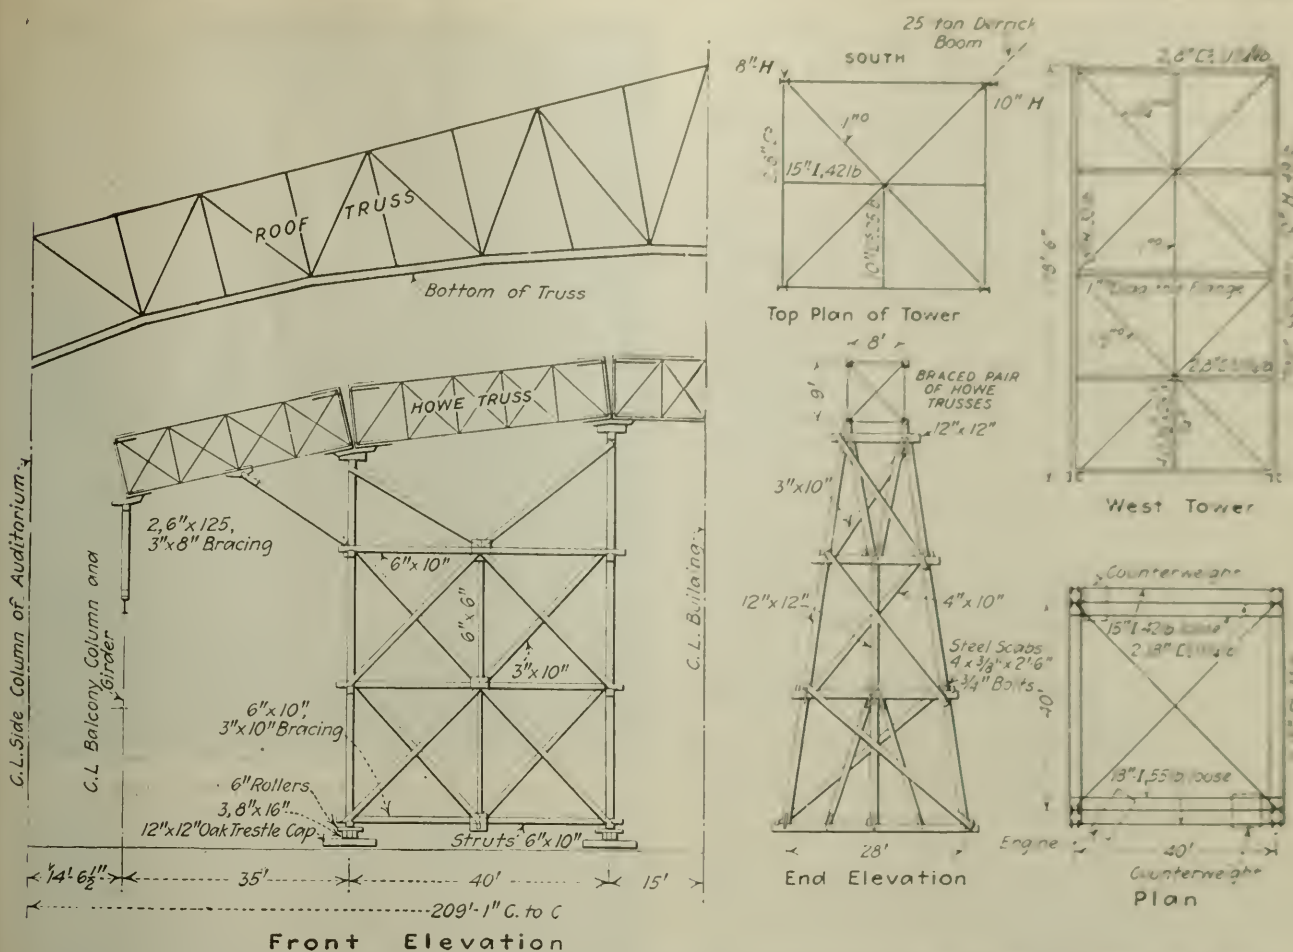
TRAVELING FALSEWORK AND DERRICK TOWERS IN ERECTION OF CLEVELAND AUDITORIUM ROOF
